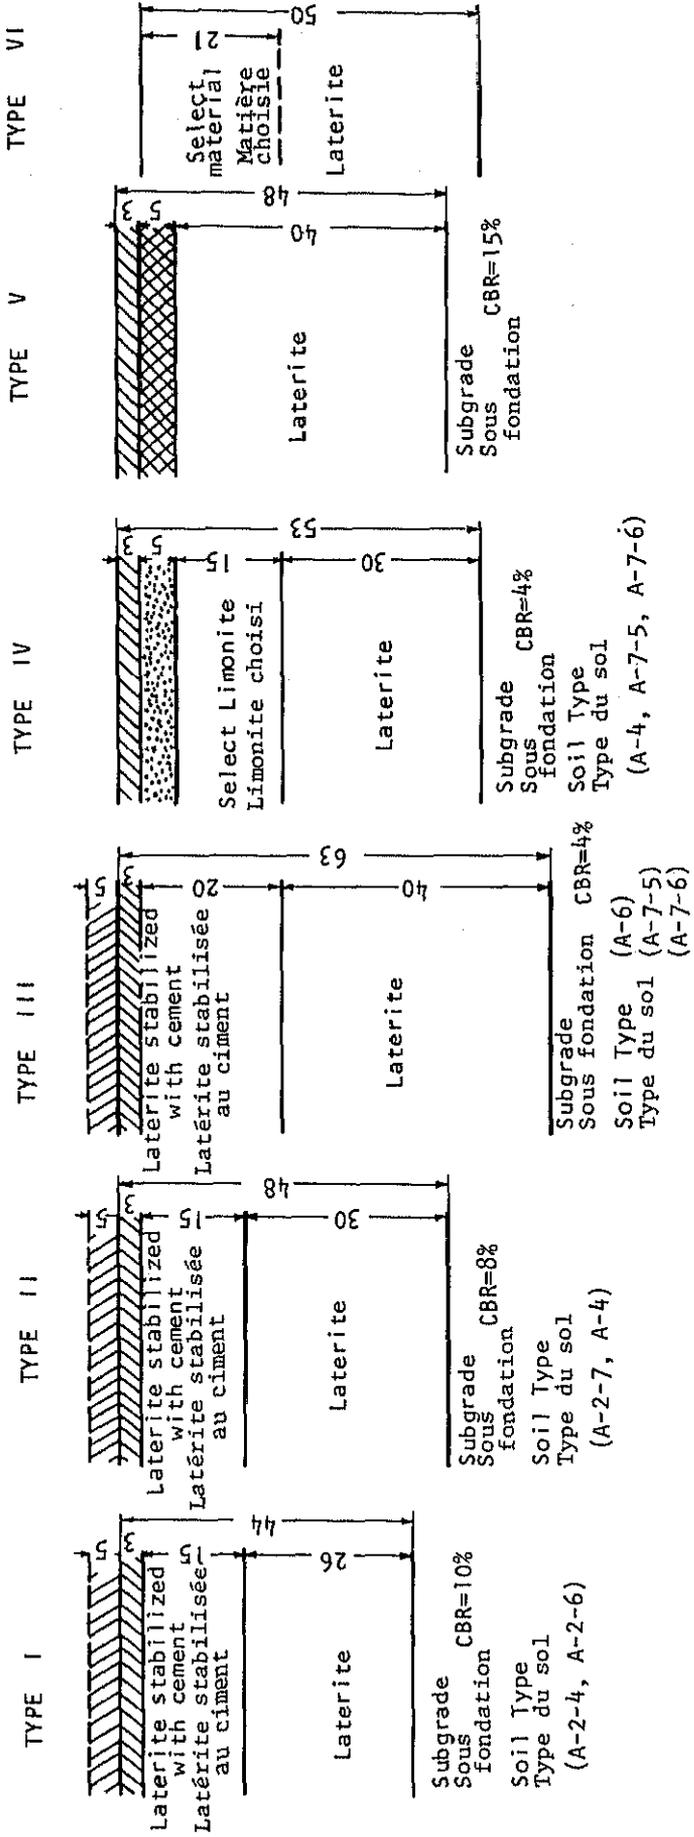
TYPES OF PAVEMENT / TYPES DU REVÊTEMENT
